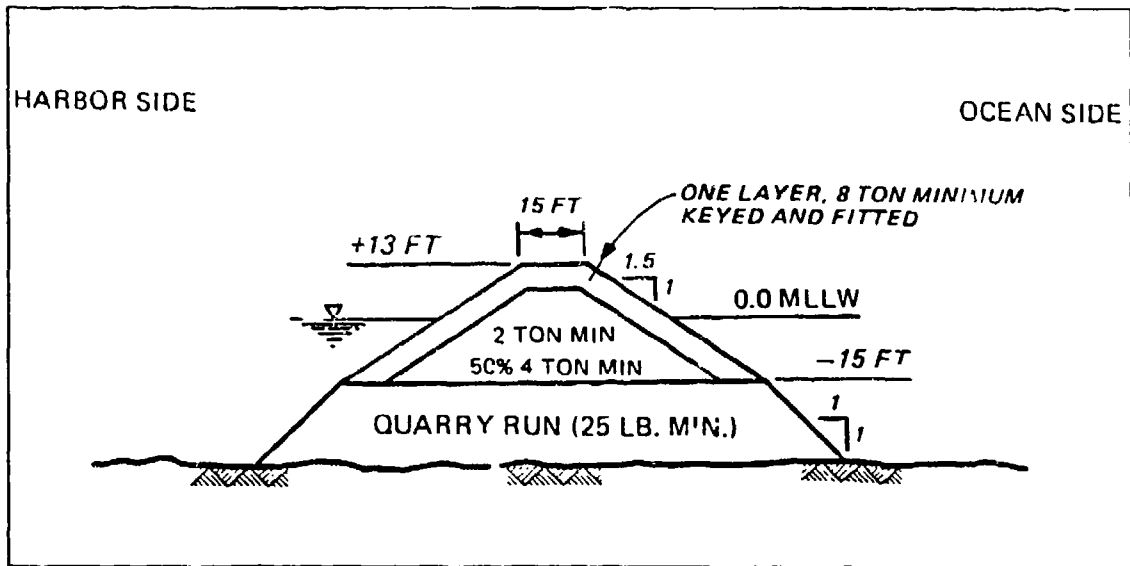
Kahului breakwater construction of 1913 (typical cross section)
